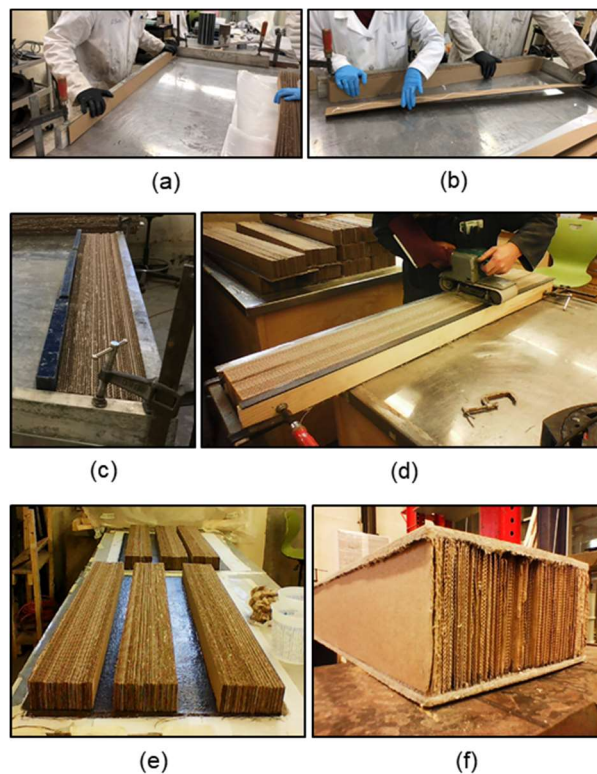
Specimen fabrication: (a) placement of first cardboard strip; (b) gluing and placement of subsequent cardboard strips; (c) glue drying on plain cardboard core; (d) sanding top of cardboard core (e) cardboard cores placed on FFRP face and; (f) finished specimen
